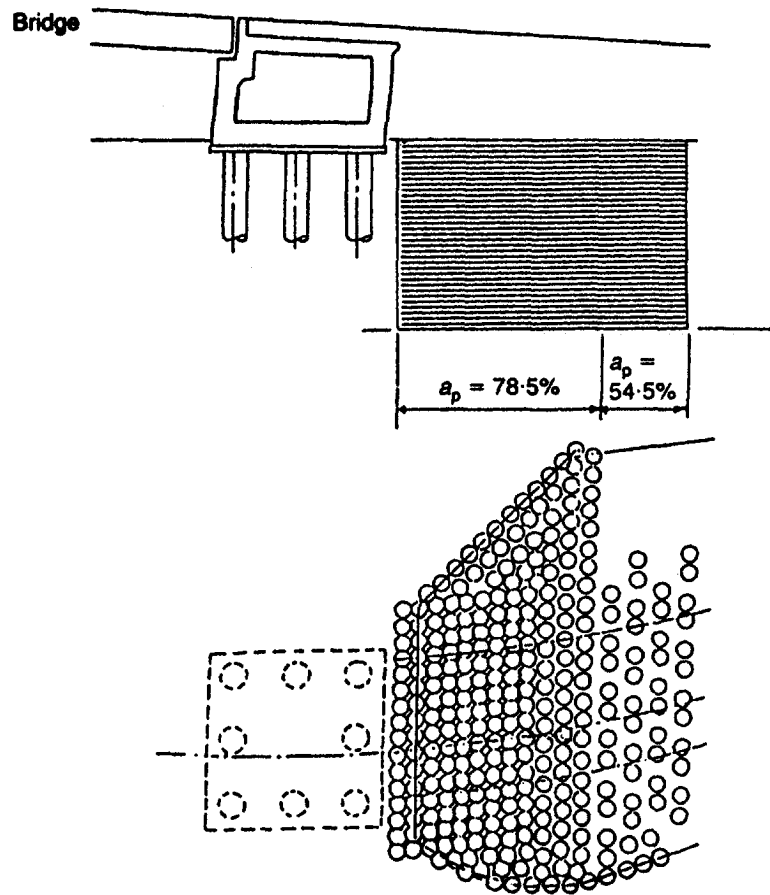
Layout of DJM piles for an abutment of a bridge (DJM Association, 1993).
